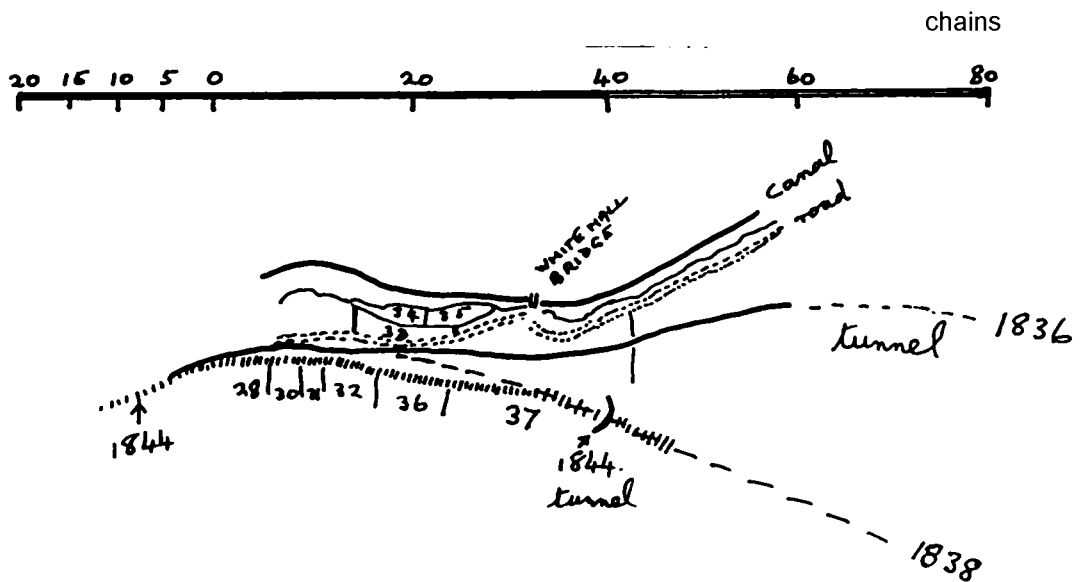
Approaches to the tunnel as proposed and as built in 1844.
